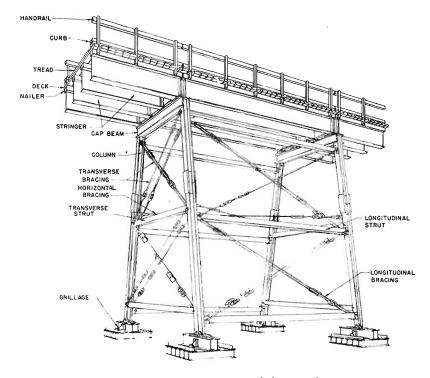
Highway bridge, class 50, single-lane, steel stringer spans, steel tower on steel grillages.
